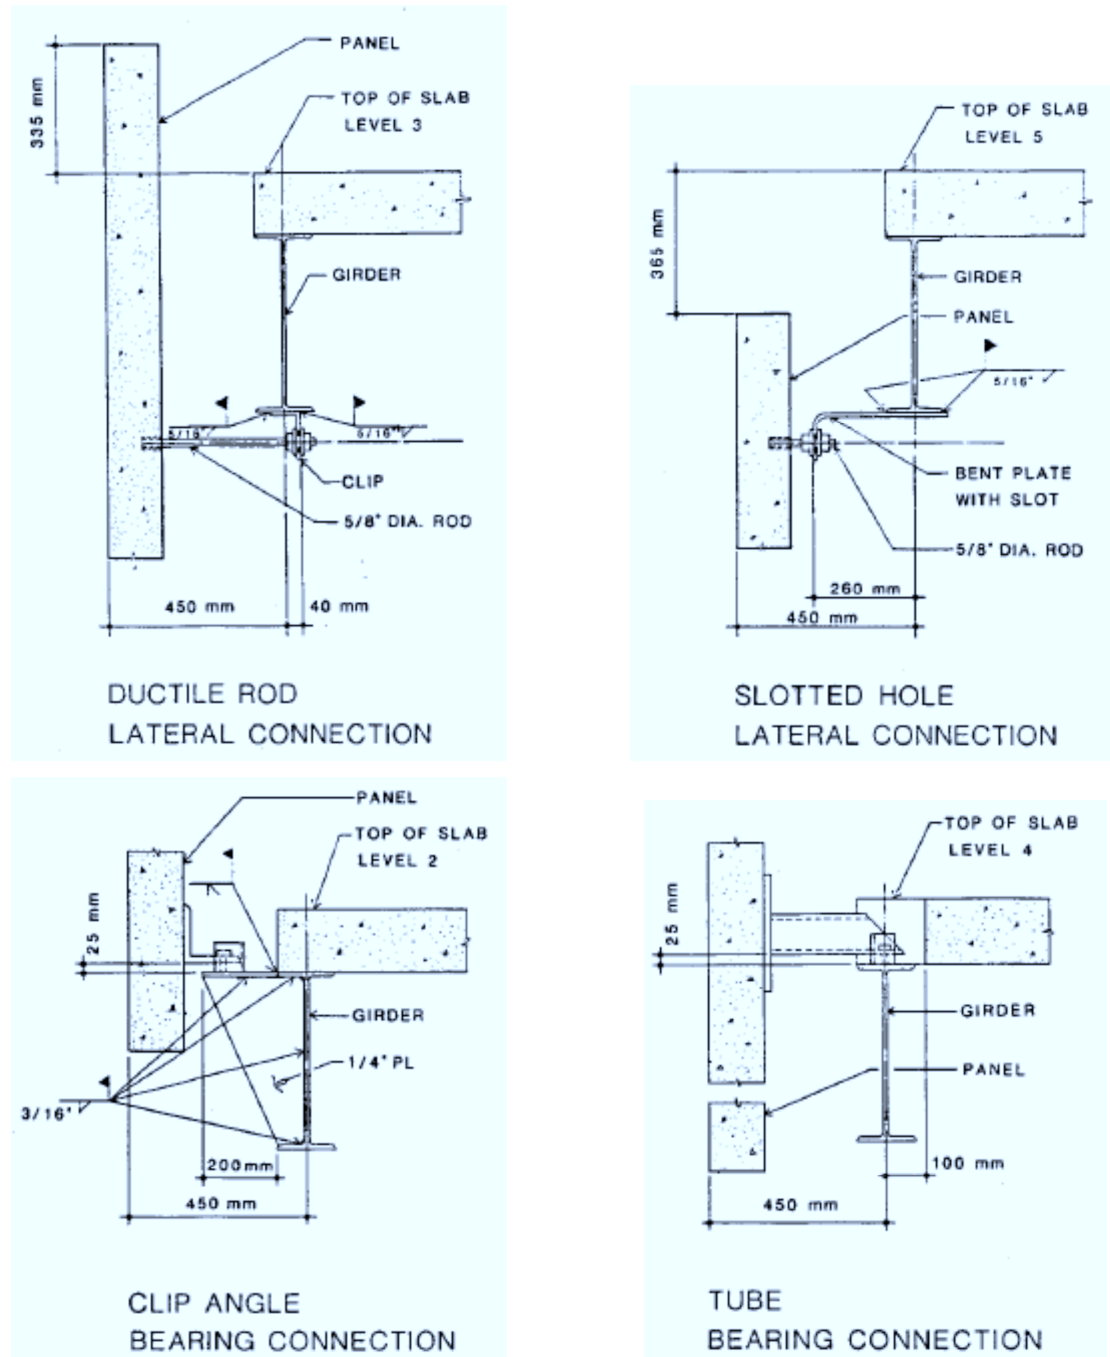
U.S. lateral (top) and bearing (bottom) connection details for cladding panels (Wang, 1987)
